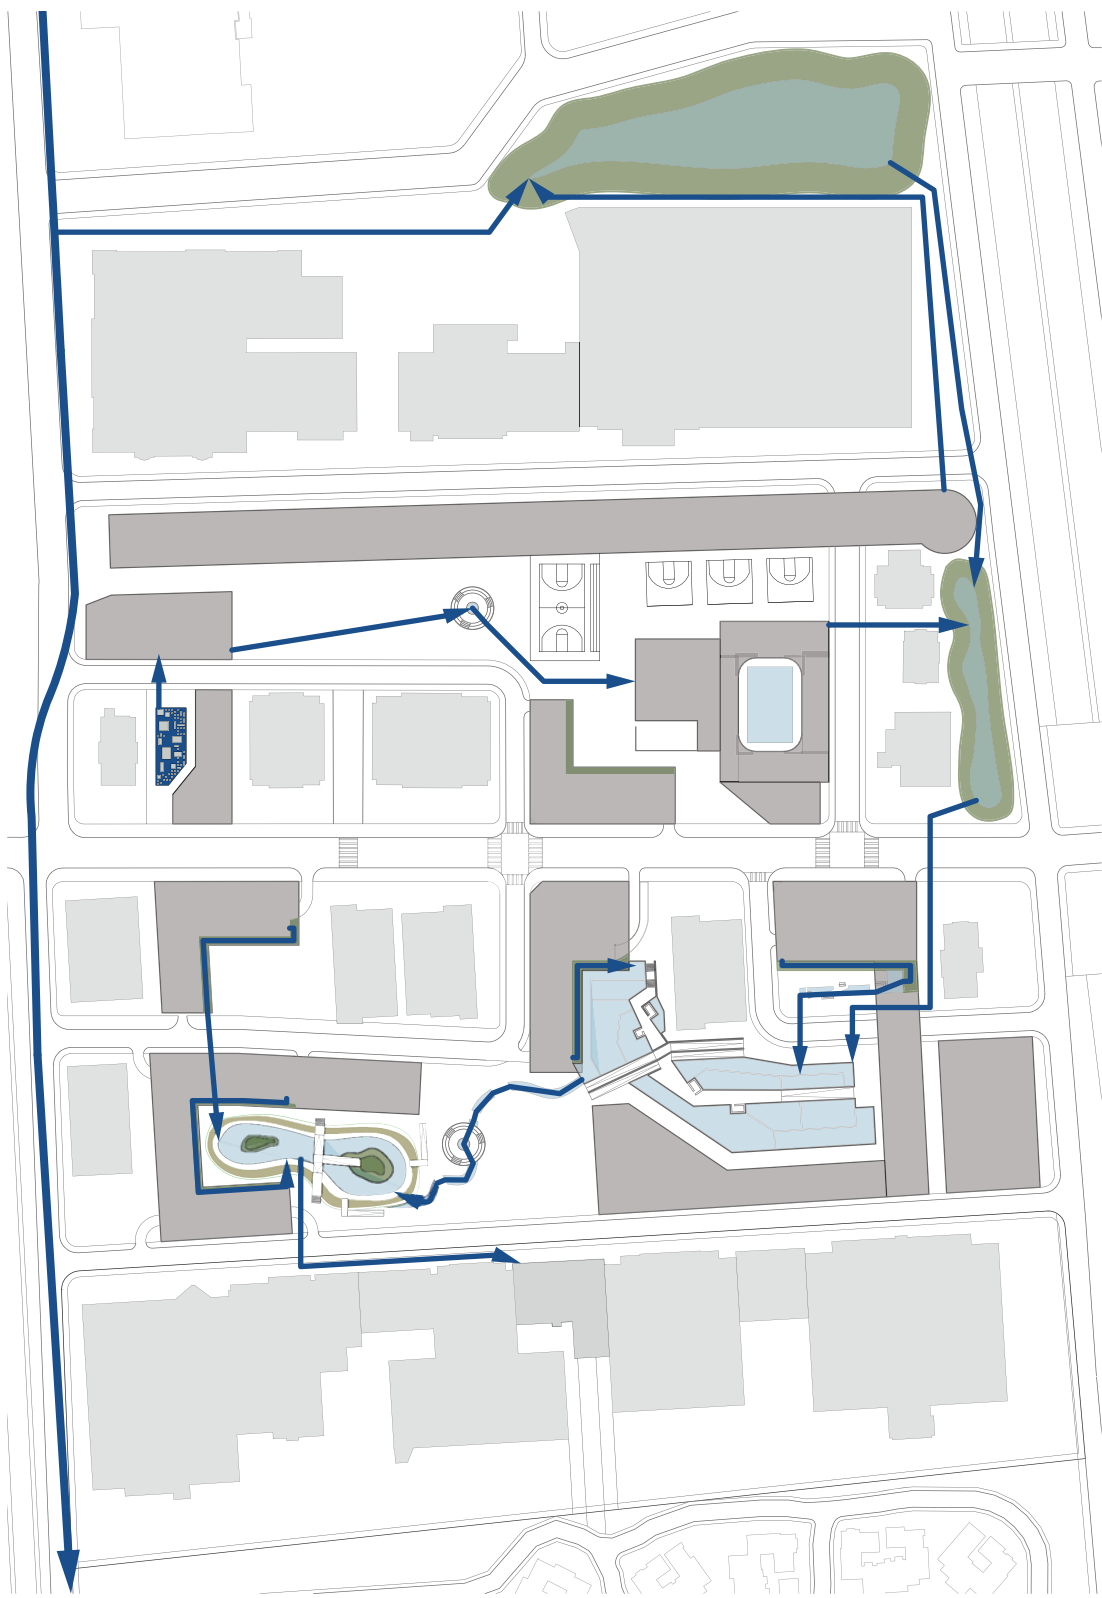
stormwater and greywater treatment schematic (1:2,500)
